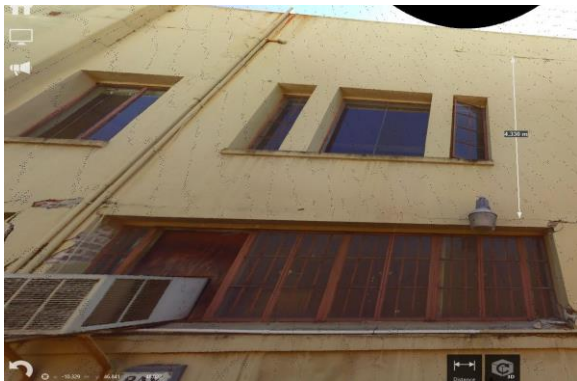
North wall Level 2 to underside Roof = 4.33m
